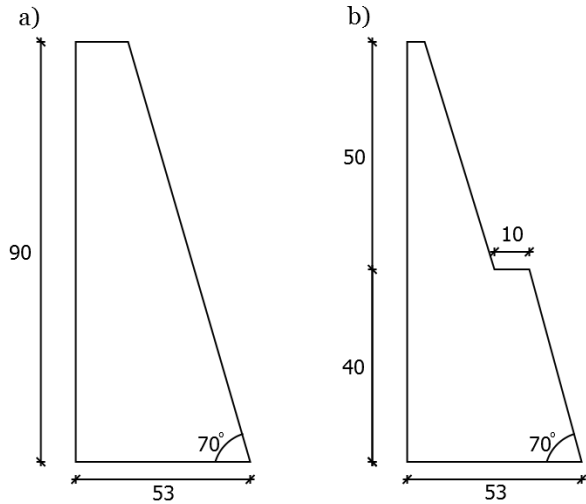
Embankment geometries used during testing (all length dimensions in mm) (a) Straight (b) Stepped.
